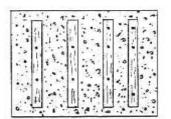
The plan view at left depicts a common V-cylinder compressor foundation. Timber footers are embedded in a concrete rectangle around 3 by 4 feet in area. Source: Author.
